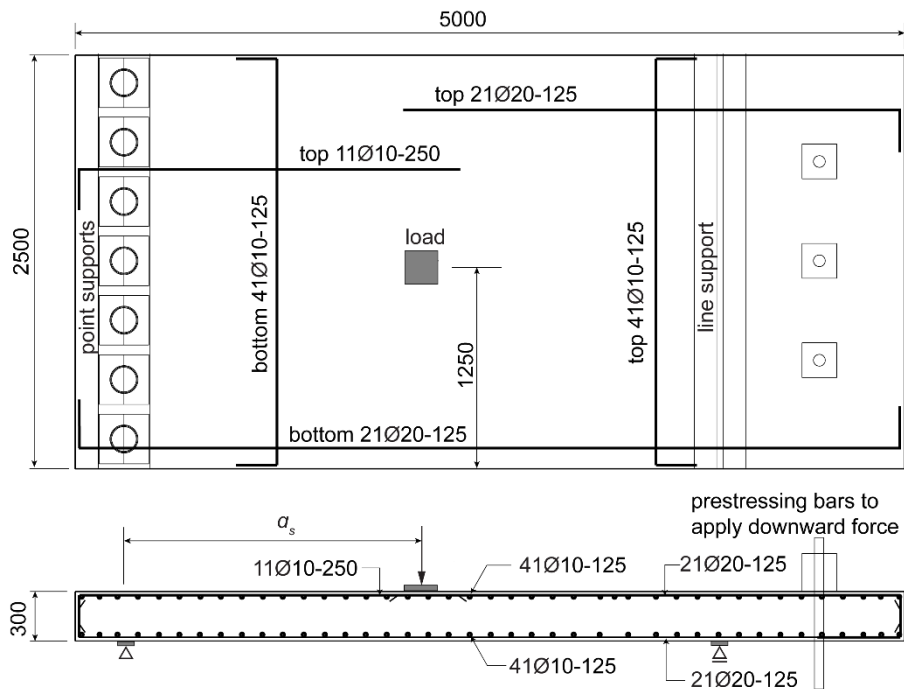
A sketch of slab configuration including slab dimension, reinforcement layout and locations of supports and load.
